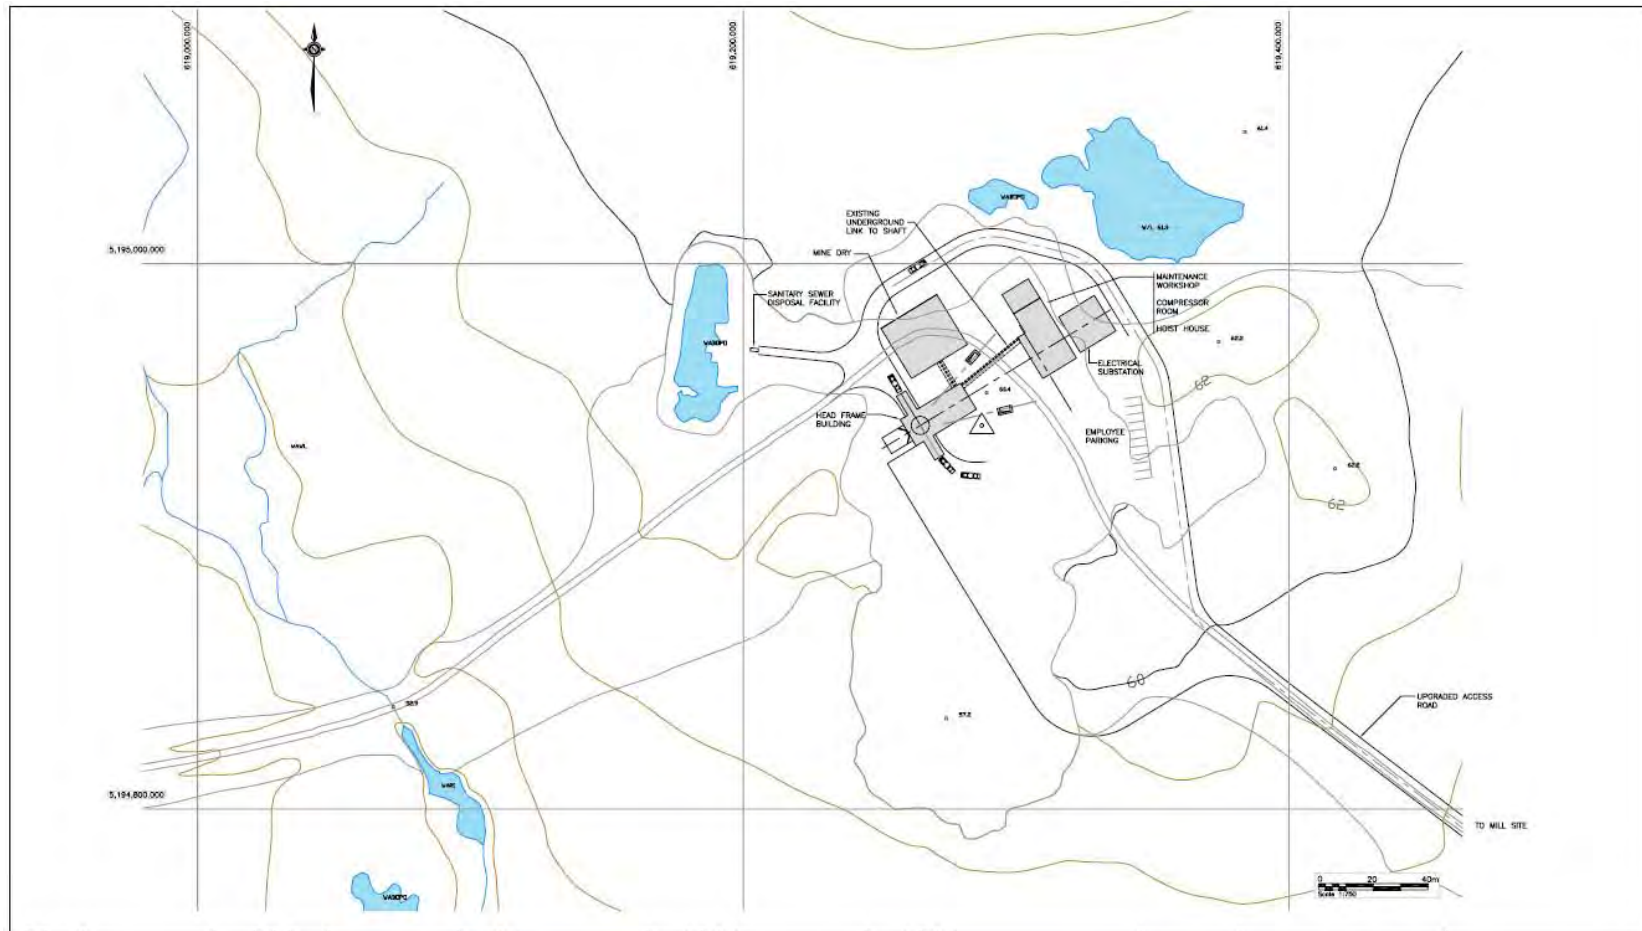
Tarefare 2 Mine Site Location Plan
